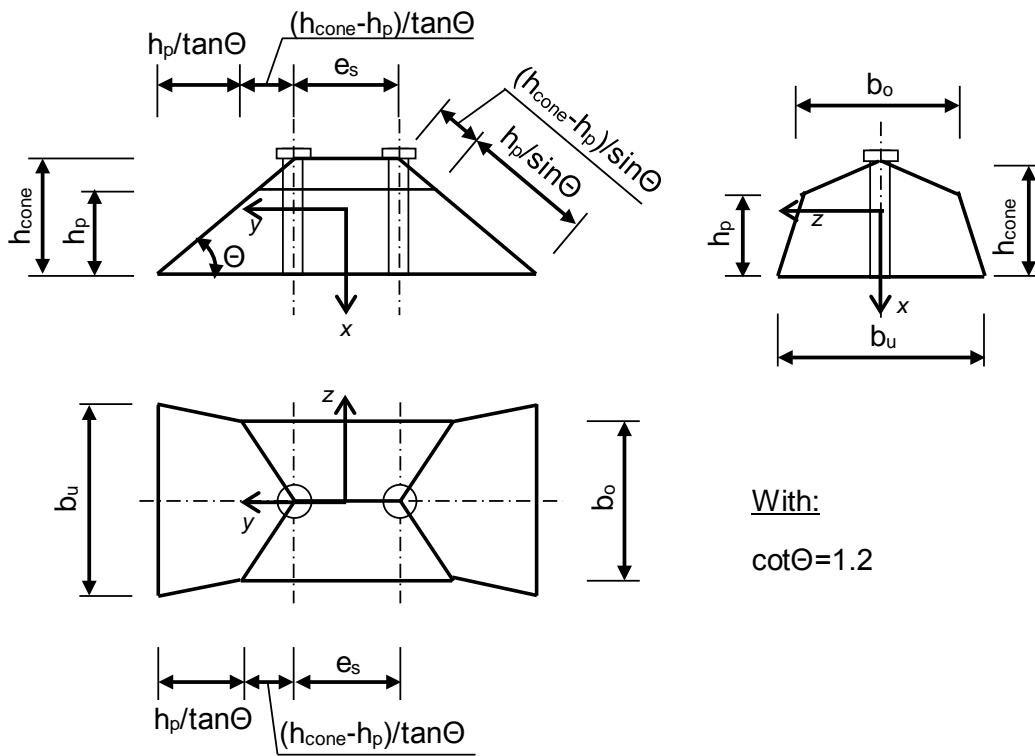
Shape and dimensions of the failure cone for studs welded in mid and stagger position in re-entrant decking.
